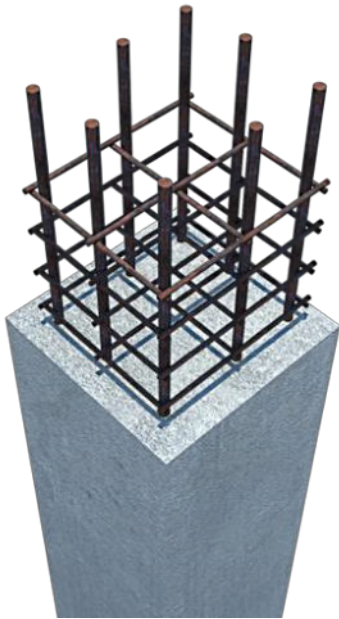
Perspective view of application of WRG as transverse reinforcement in RC column
